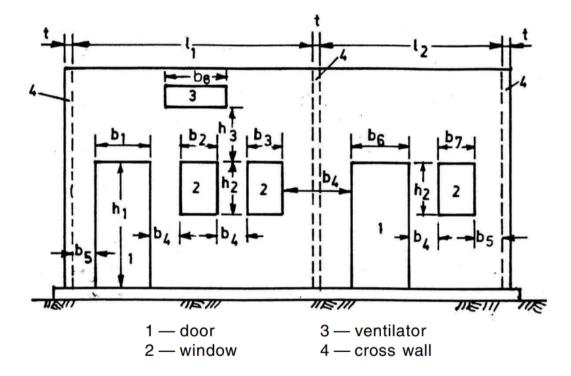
DIMENSIONS OF OPENINGS AND PIERS FOR RECOMMENDATIONS IN TABLE 4
